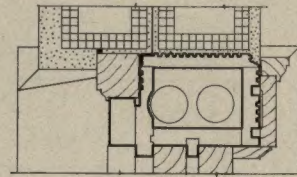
Standard block or tile wall using special moulding with regular moulding No. 402. Note use of special metal anchor strip in mortar joint.
